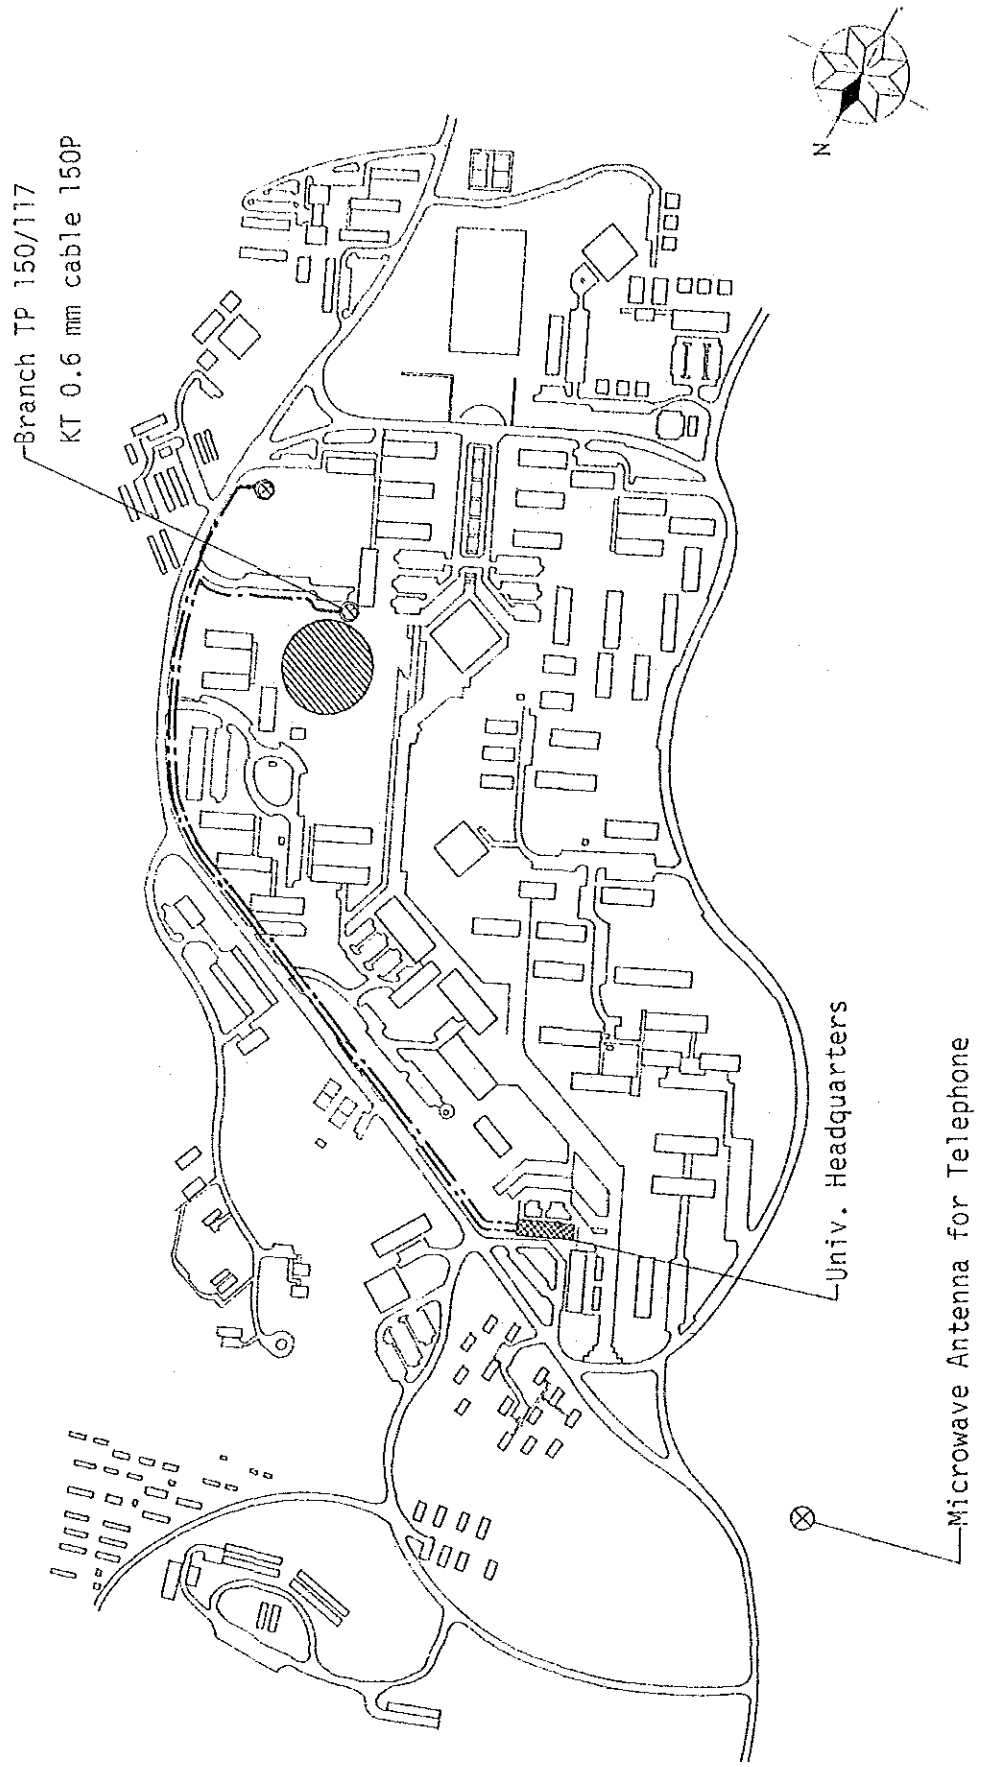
Telephone Trunk Line Plan by Master Plan
